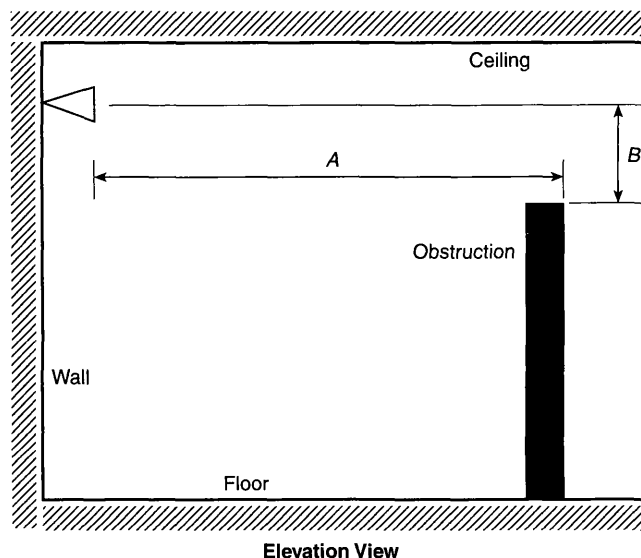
Suspended or Floor-Mounted Obstructions (Extended Coverage Sidewall Sprinklers).
